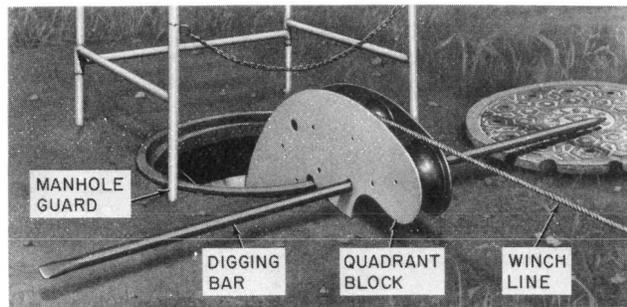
Pulling Arrangement Using Quadrant Block on Manhole Frame
